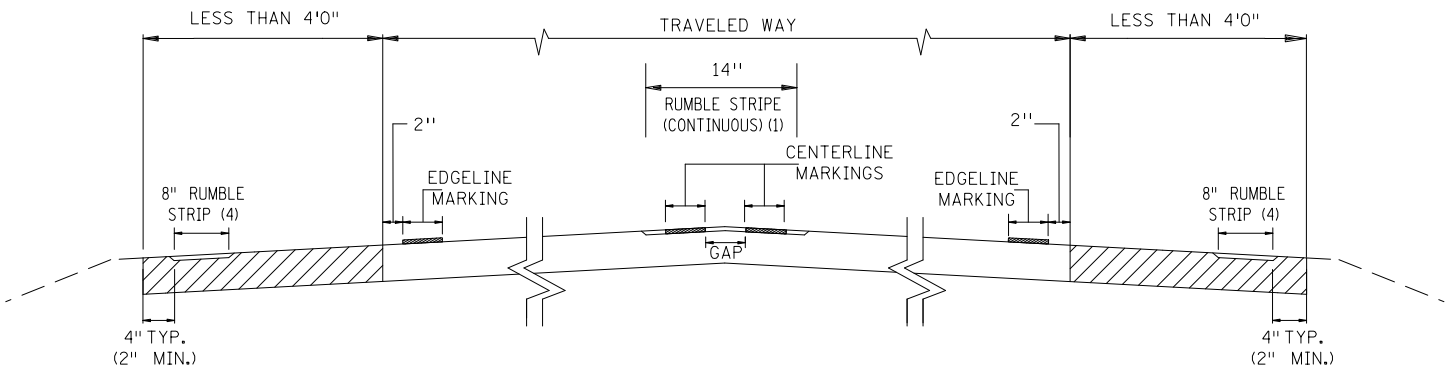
C - BITUMINOUS PAVEMENT WITH LESS THAN 4' PAVED SHOULDERS
